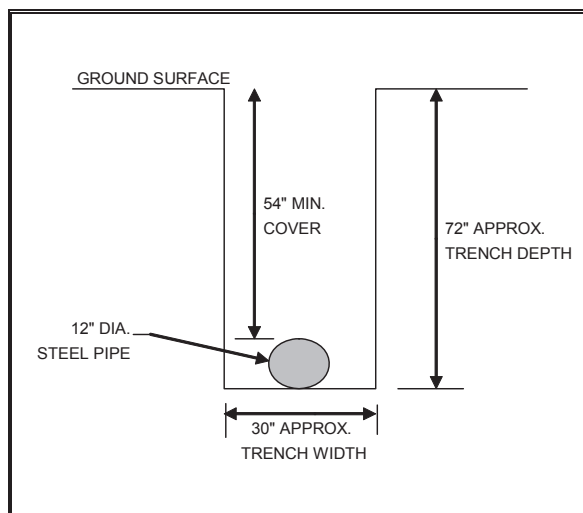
Typical Cross Section, Natural Gas Pipeline Open Trench Installation
